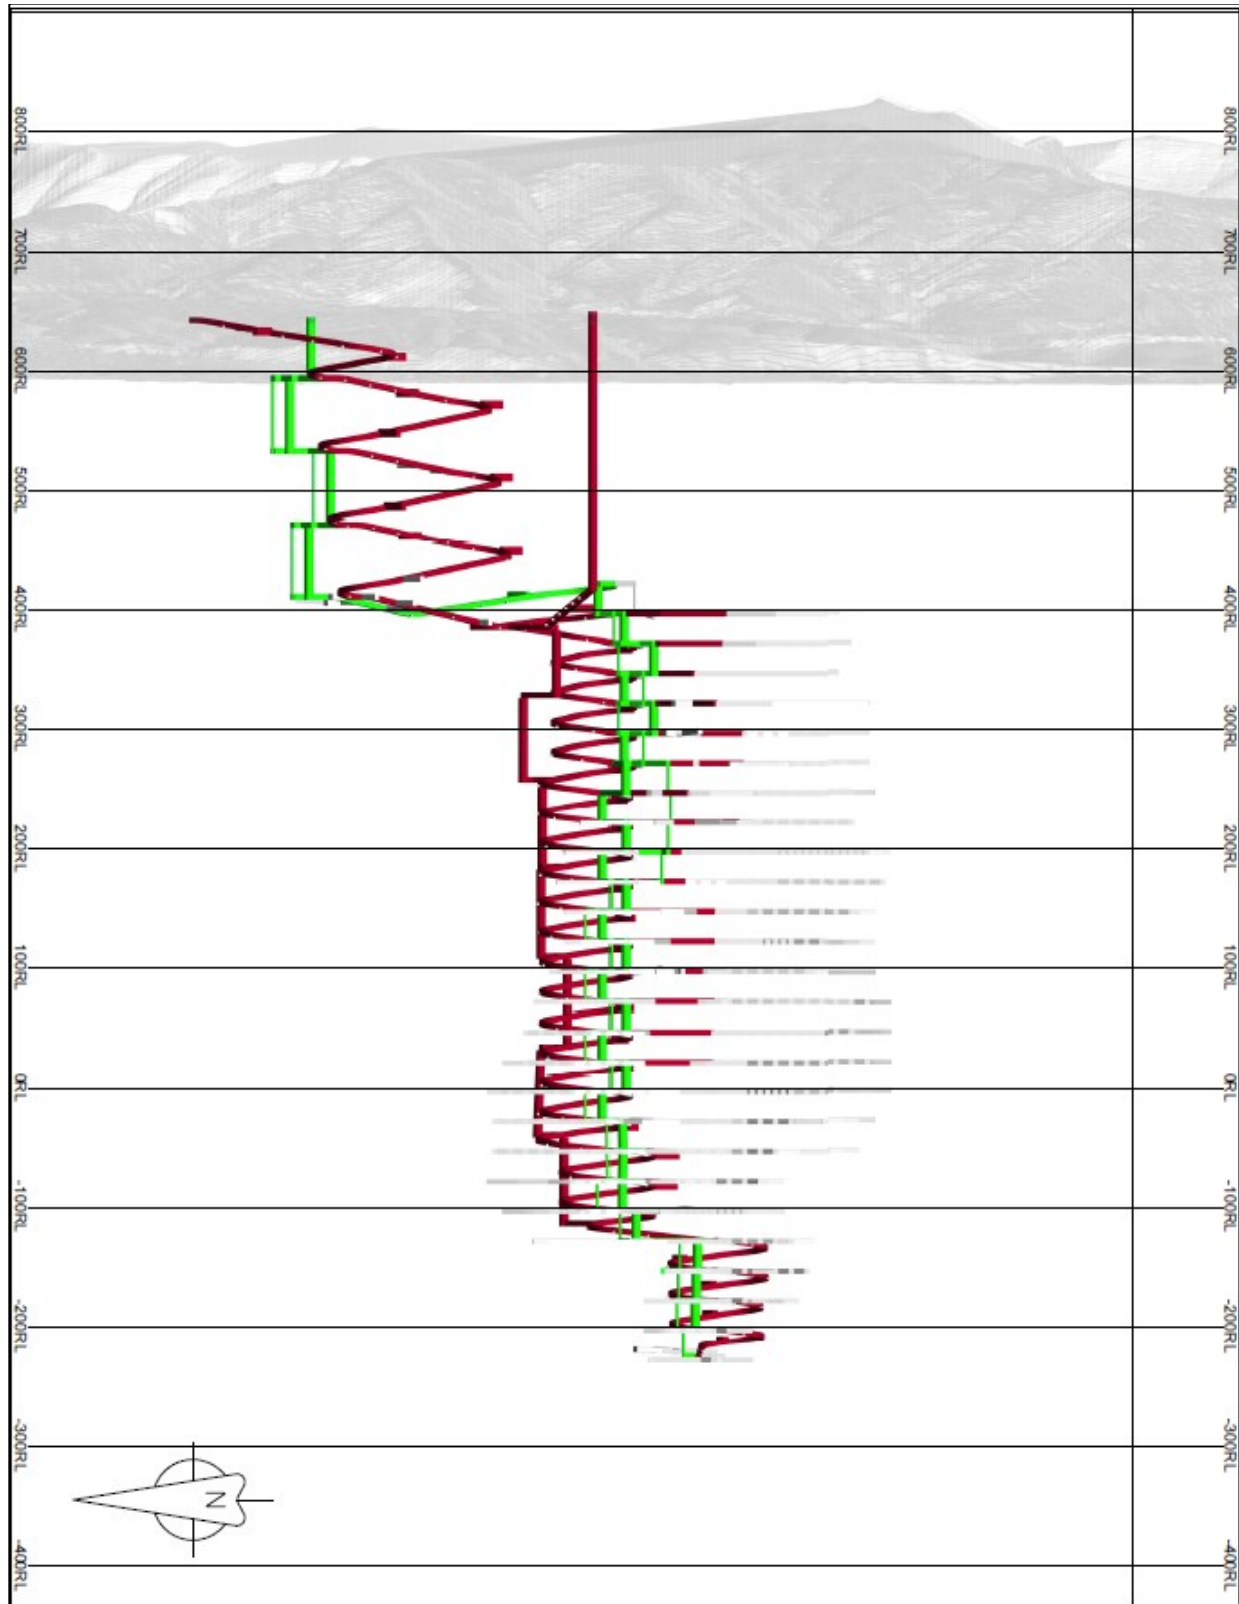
and Figure 16.14 illustrate the permanent underground mine ventilation network. Fresh airflow is indicated in green, the exhaust system in red, and areas supplied by auxiliary ventilation fans in grey.
